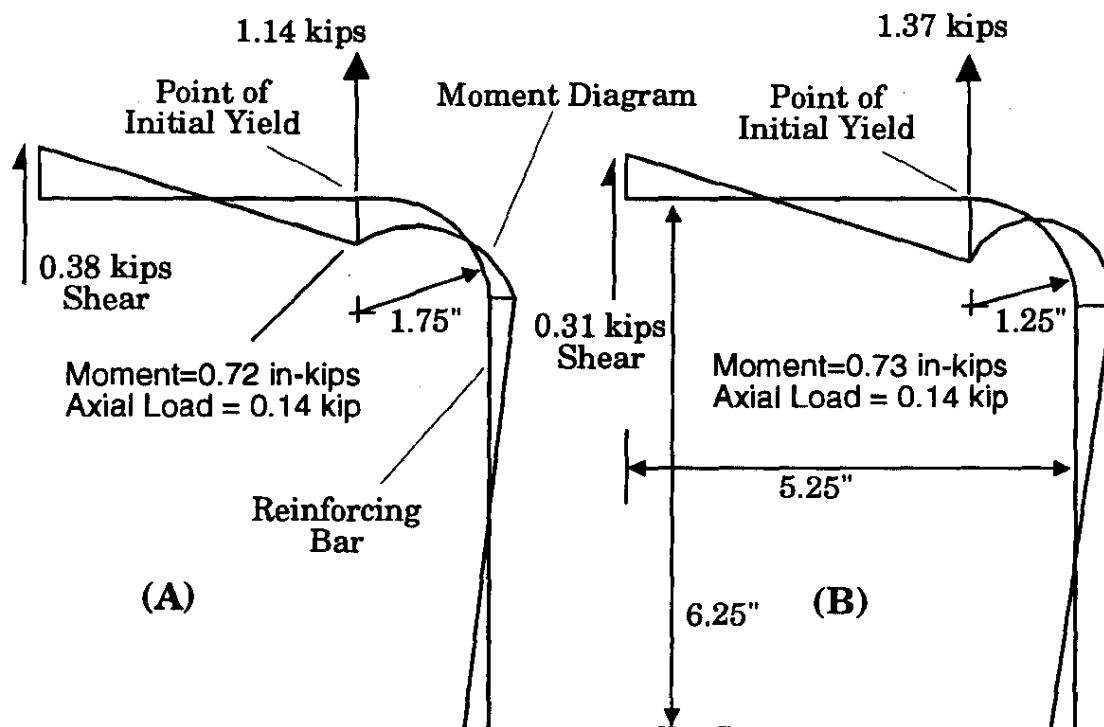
Failure Through Inadequate Concrete Cover
